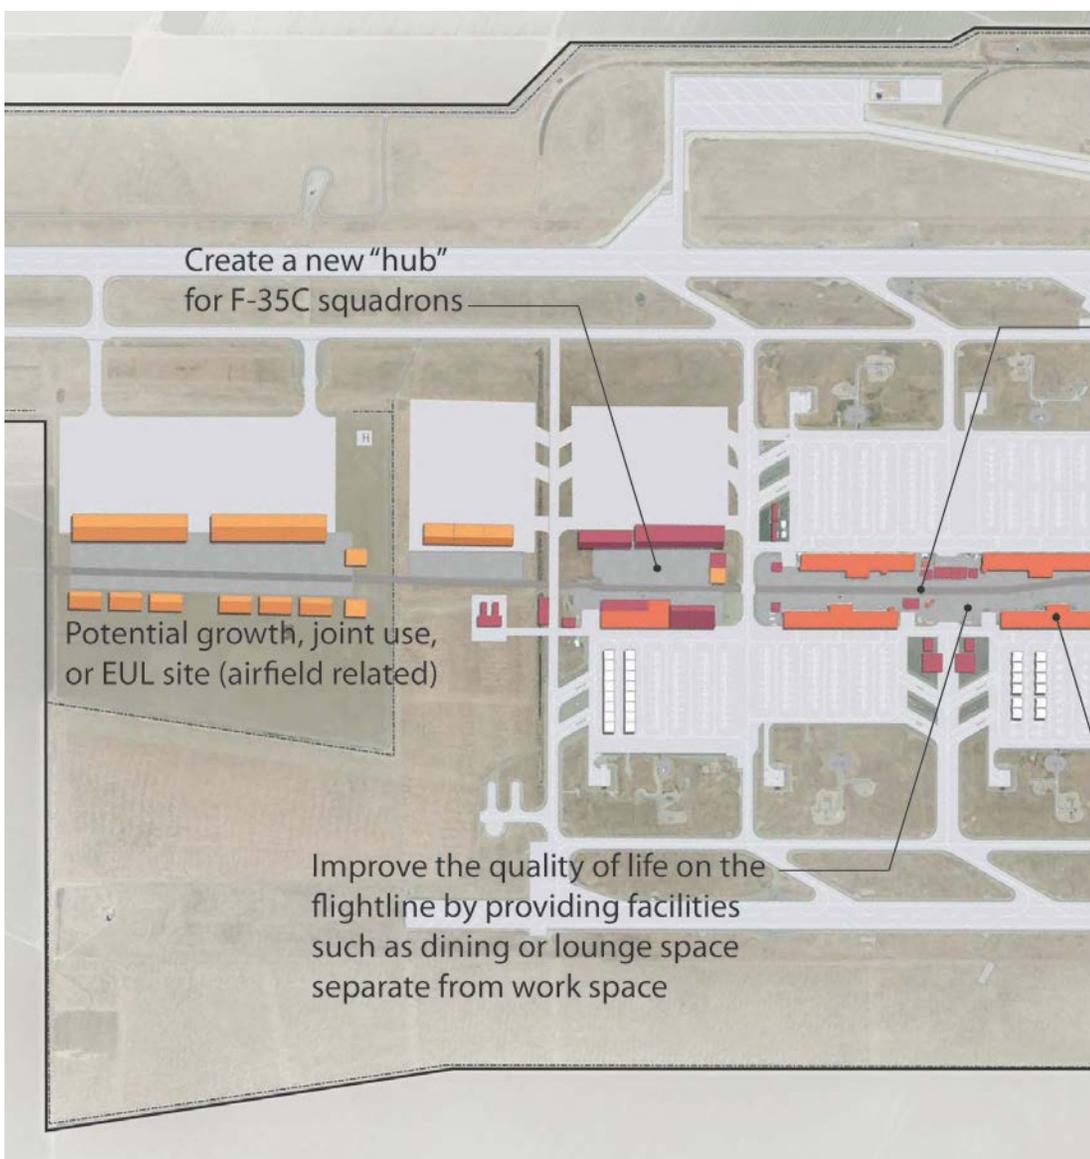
ILLUSTRATIVE PLAN DIAGRAM
